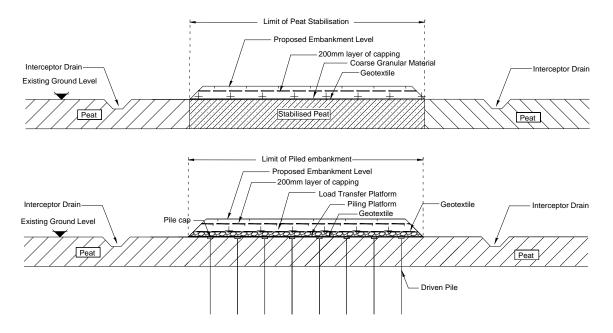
(a) Typical cross sections of a stabilised embankment (b) typical cross sections of a piled embankment
